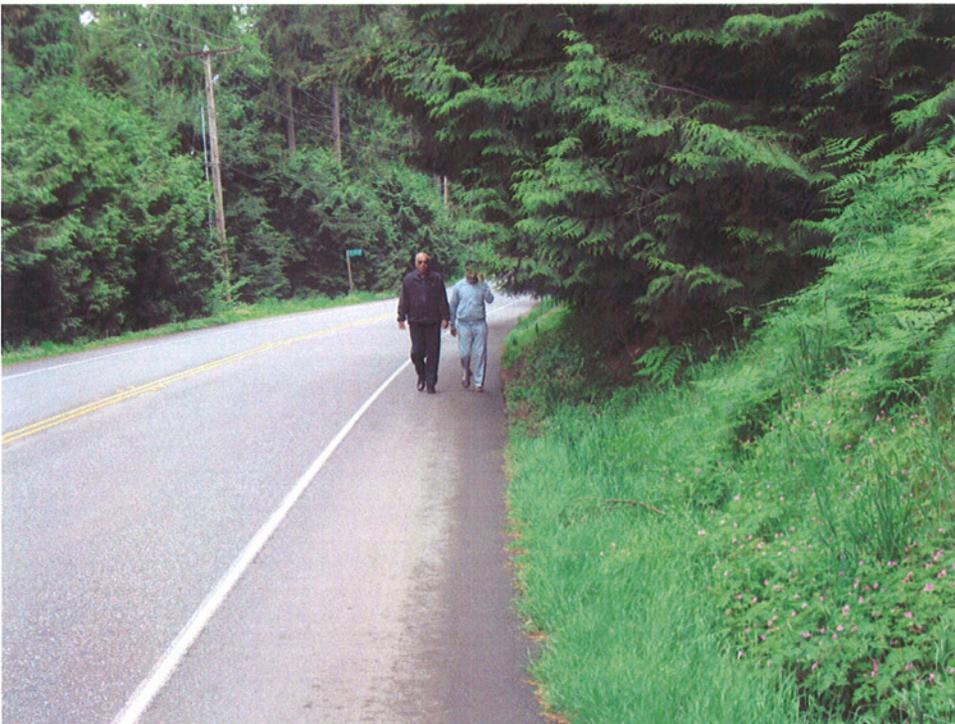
NE Inglewood Hill Rd: 150ft east of 219th Ave NE looking west.
